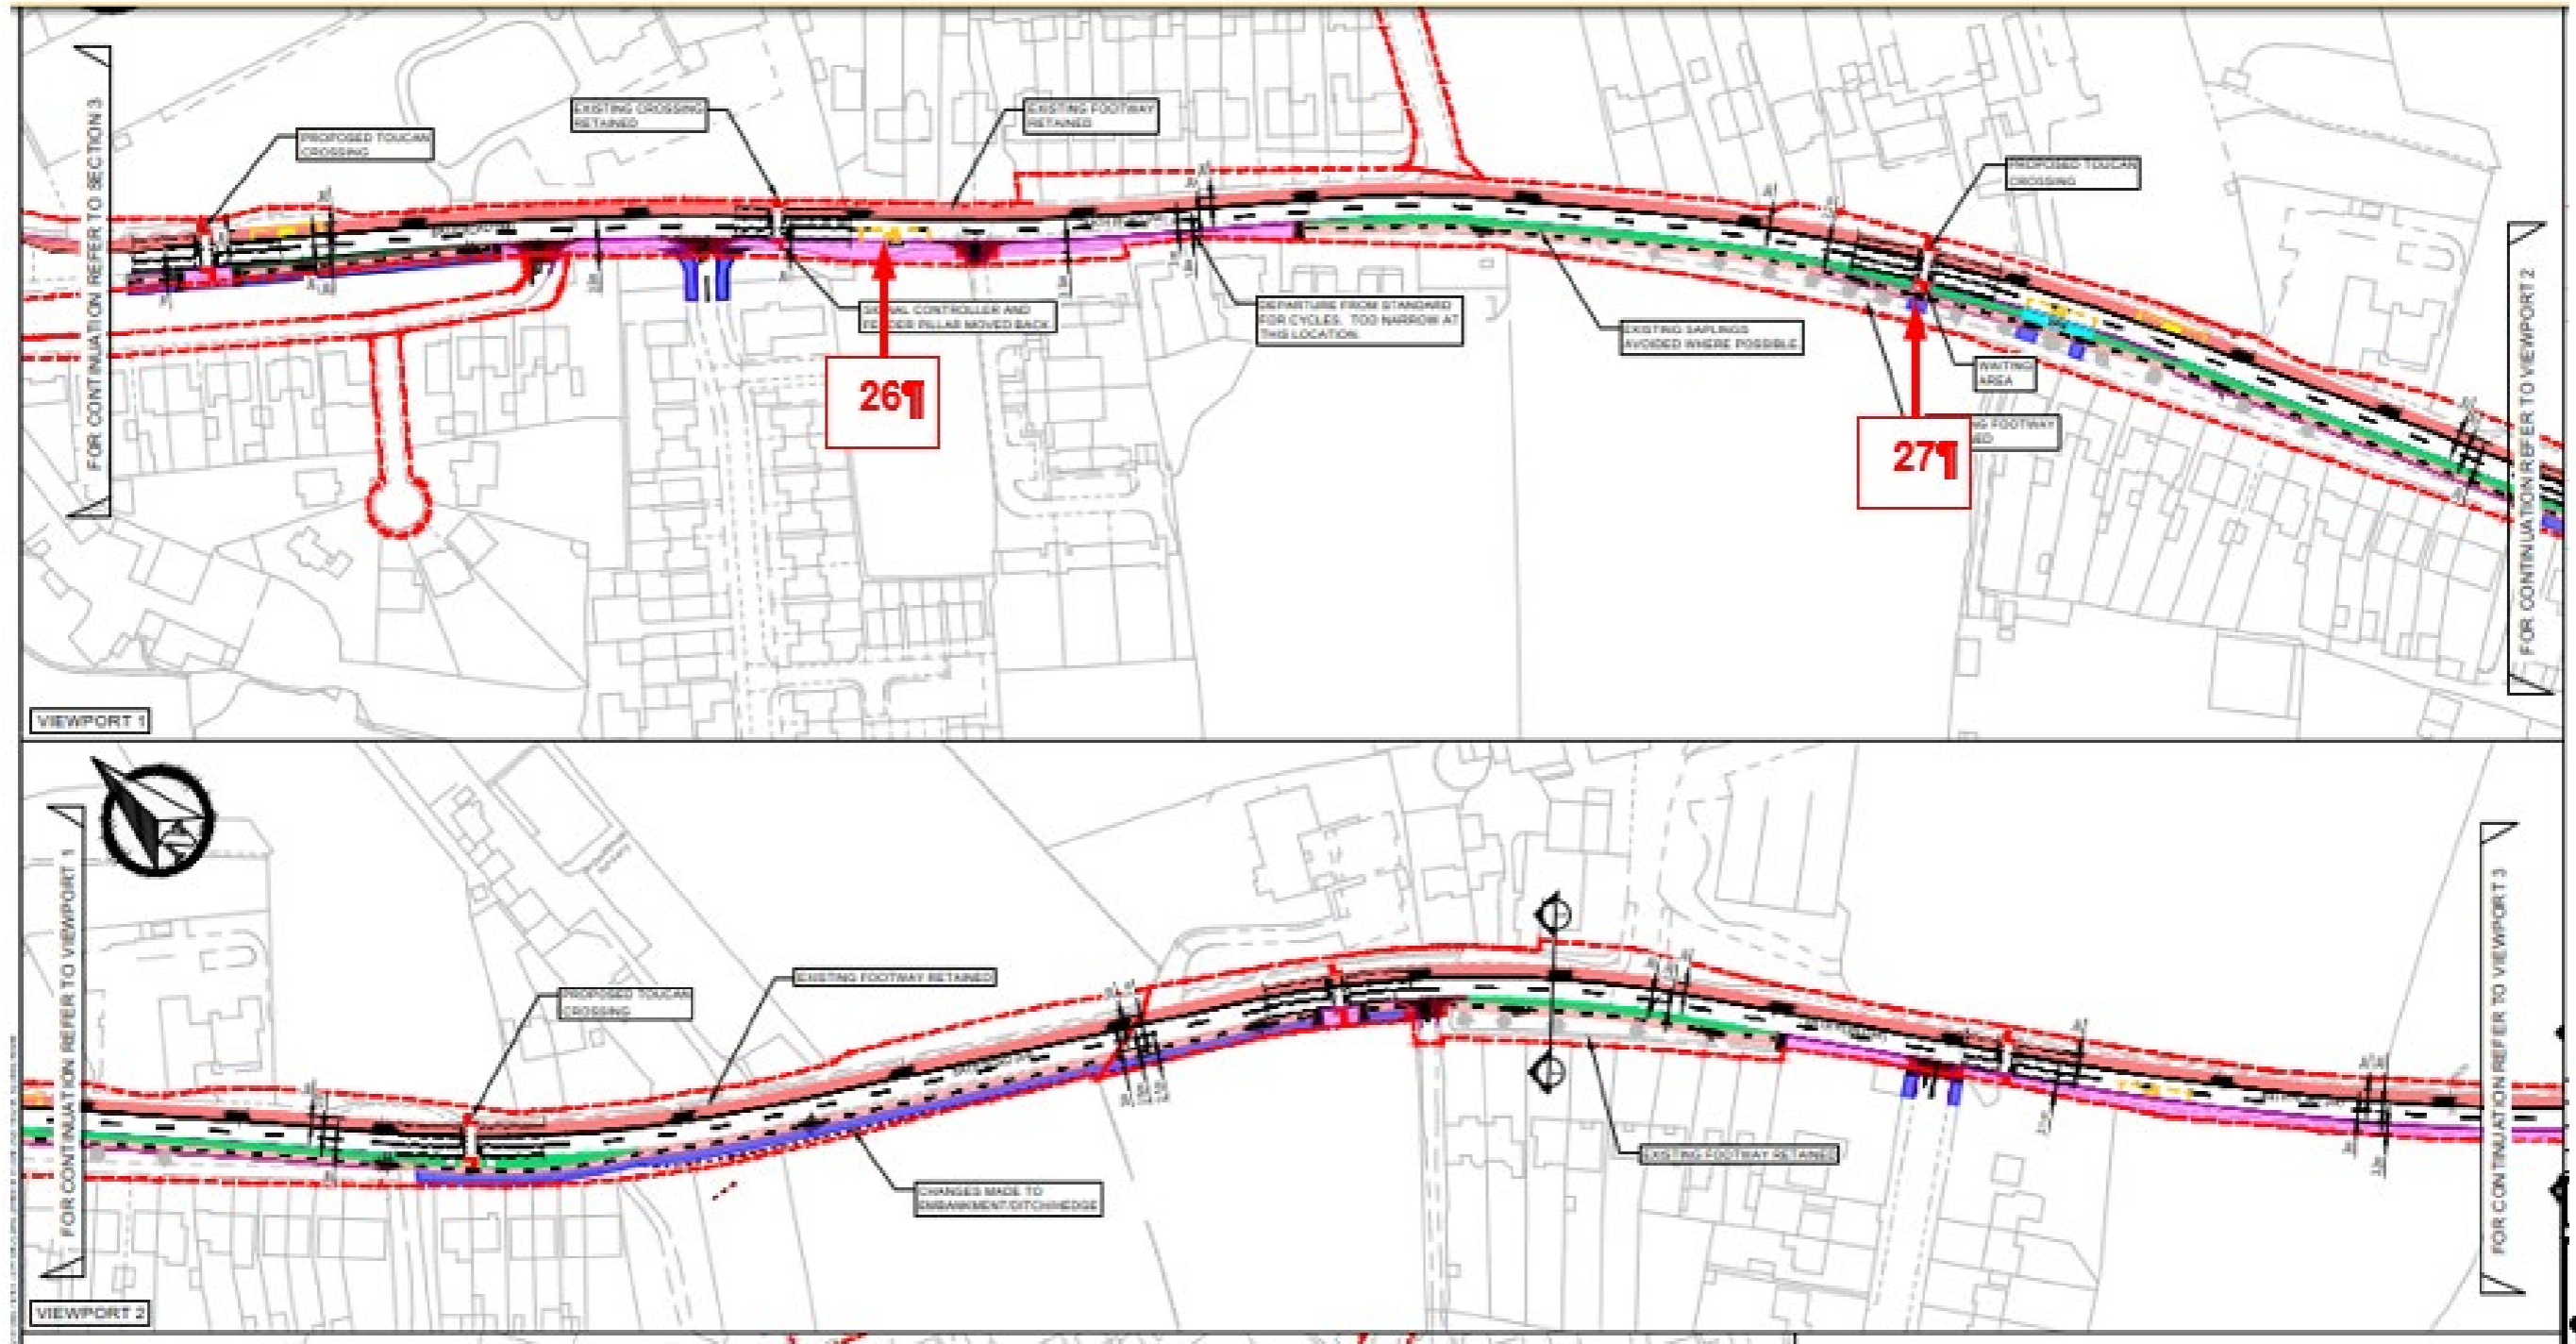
Section 4 Road Safety Audit Problem Location Plan
